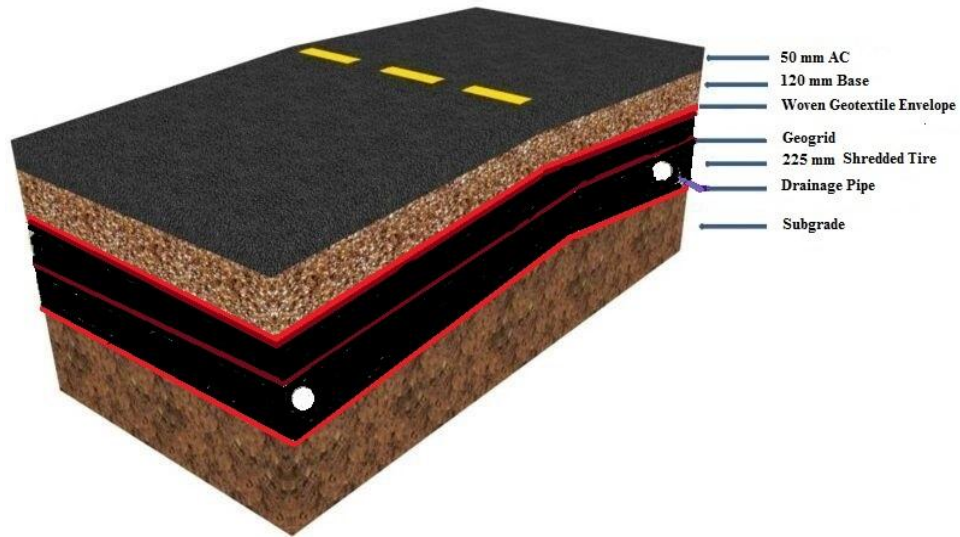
Design Cross Section of Shredded Tire Test Section
